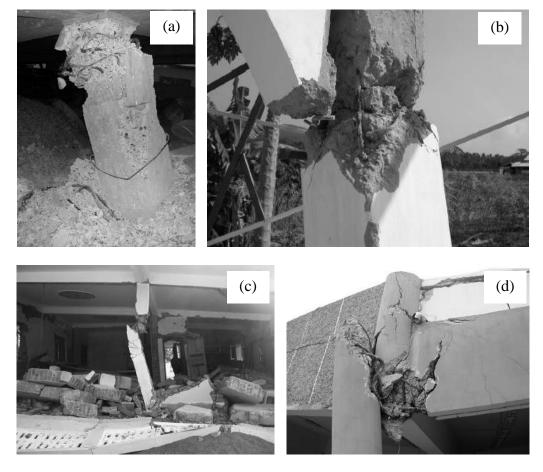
Columns failure in RC buildings due to poor shear design during 2004 Sumatra Earthquake and Tsunami; (a), (b) and (c) buckling of longitudinal bars due to 90° hooks opened up and (d) shear failure of column at beam-columns joint (Kaushik and Jain, 2007)
